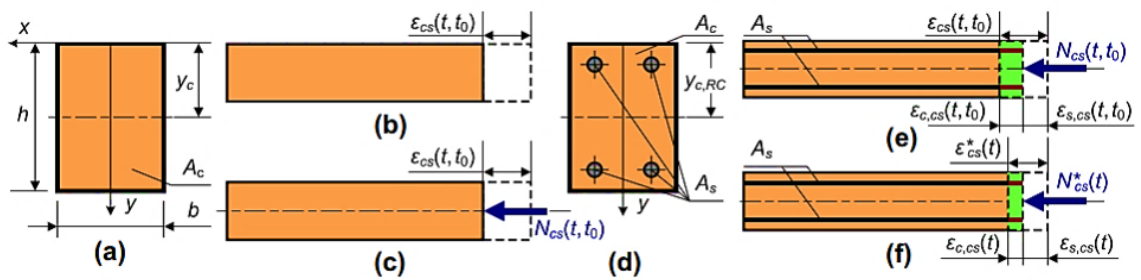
Shrinkage stresses and curvatures in a sections restrained by a single reinforcement (Gilbert & Ranzi, 2010)
